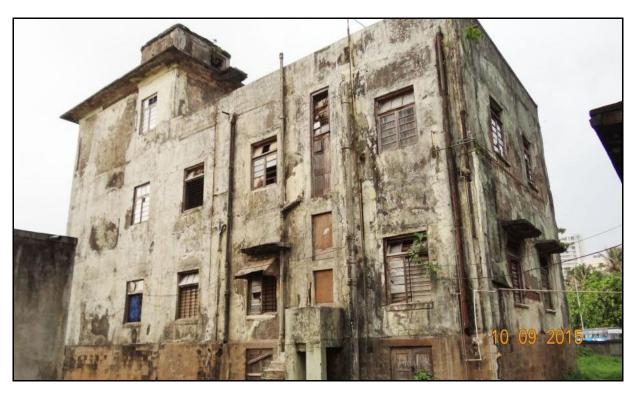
Photographs of Existing Buildings at Proposed Site
